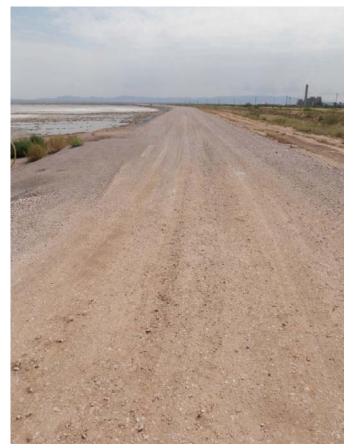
Crest of south embankment of Scrubber Sludge Pond 1, looking east.
